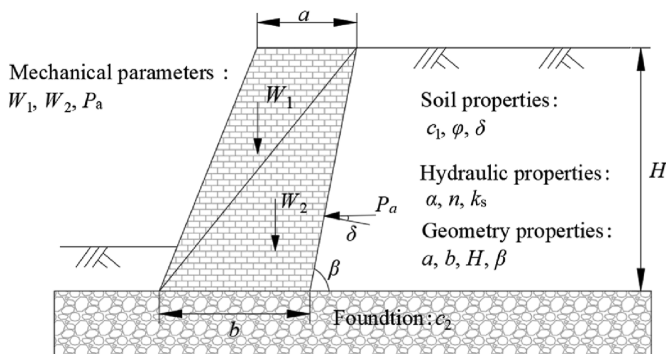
Longitudinal schematic diagram of a semi-gravity retaining wall.
